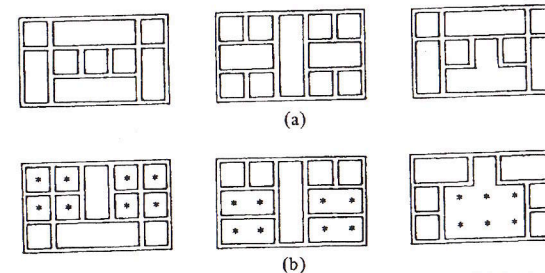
Plans shown in (a) satisfy proviso 3; plans in (b) fail to do so.
